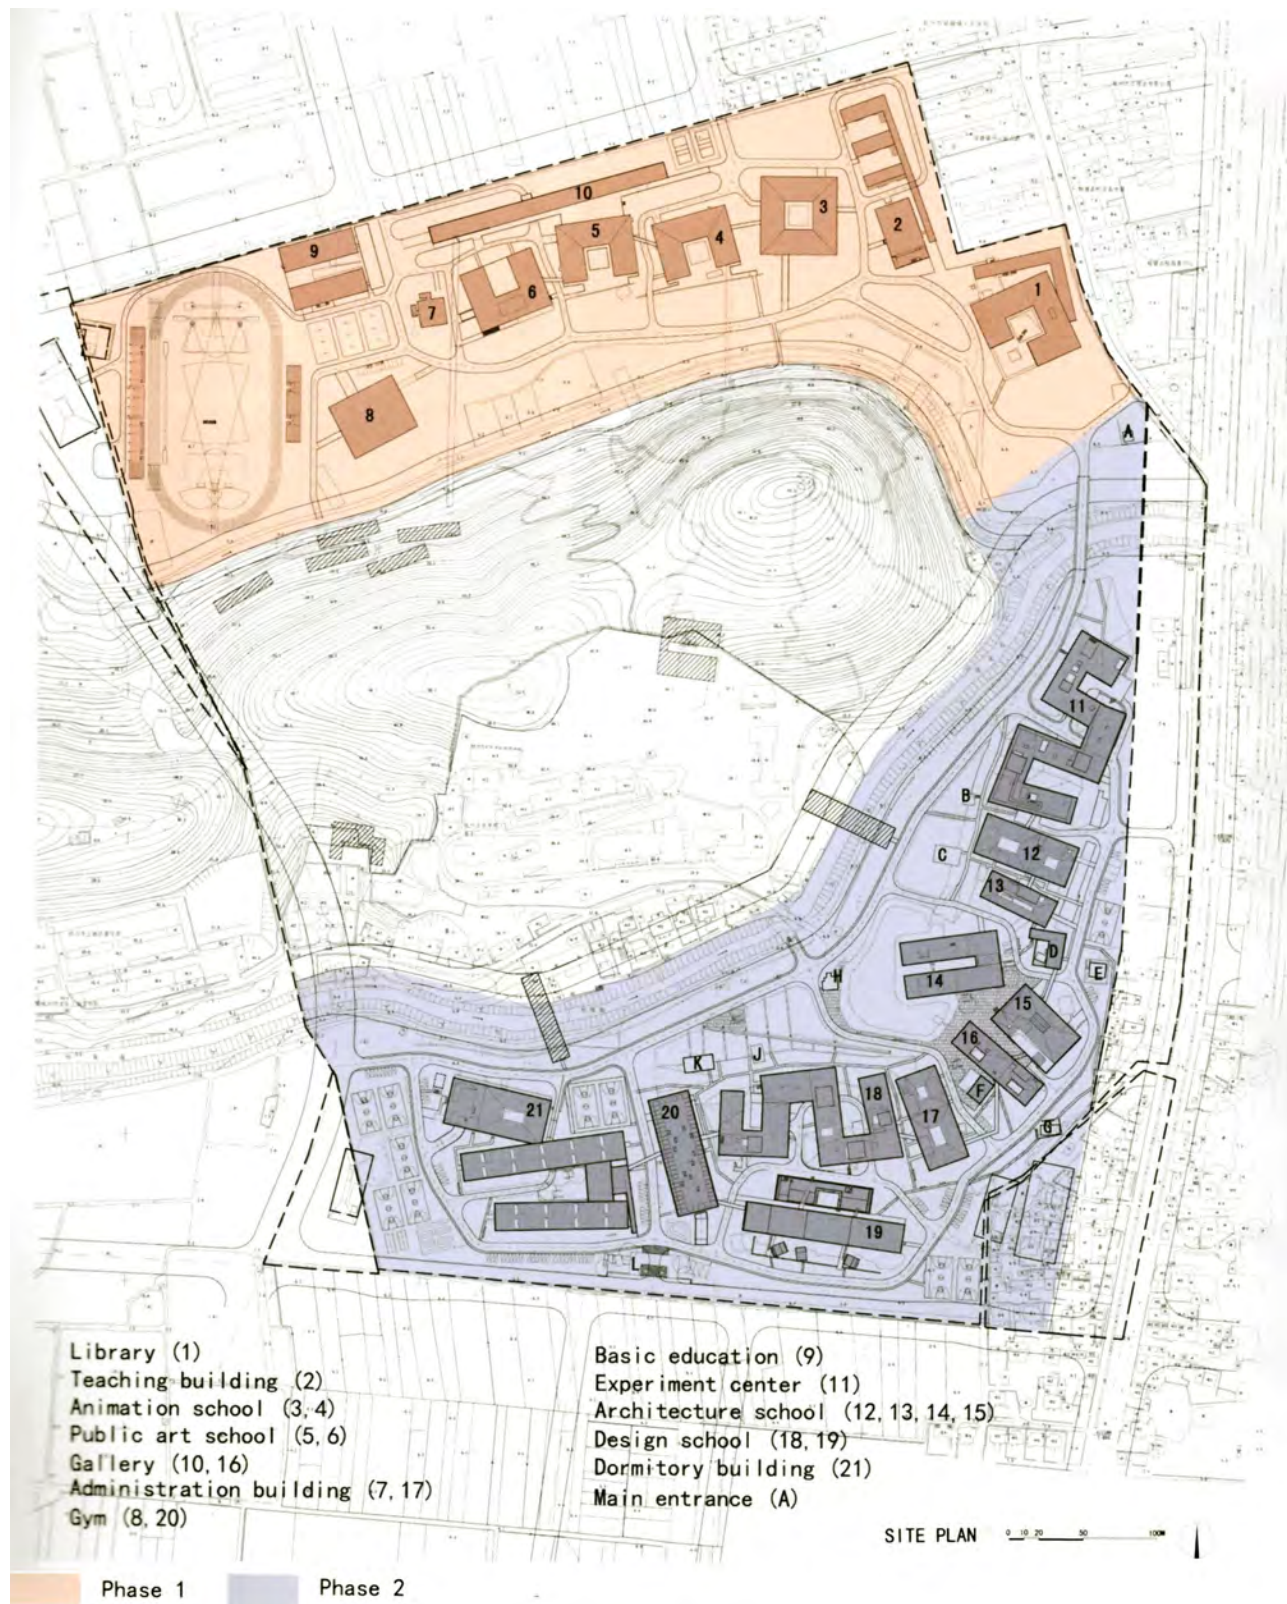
Frampton, K., Dong, Y et al., Plan of Xiangshan Campus, 2017
